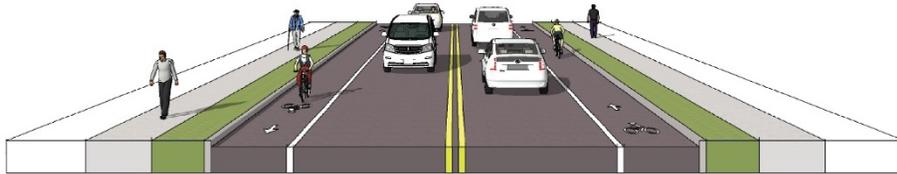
Arterial Cross-Section Without Center Turn-Lane
